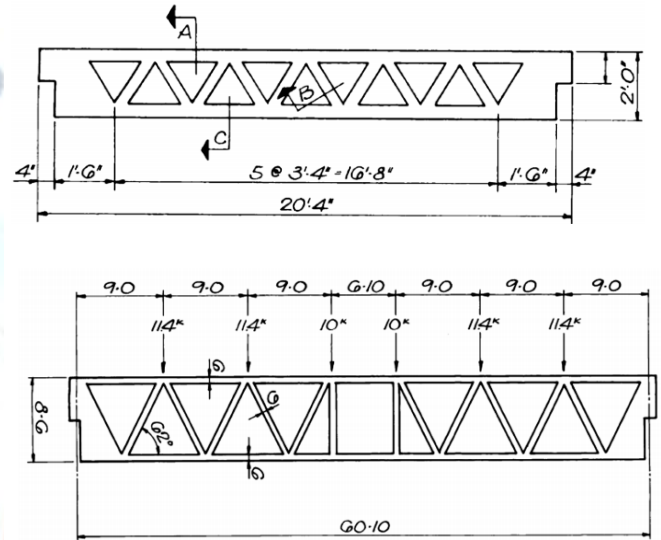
2 Concrete truss prototype-II (Carroll and al. 1978)
